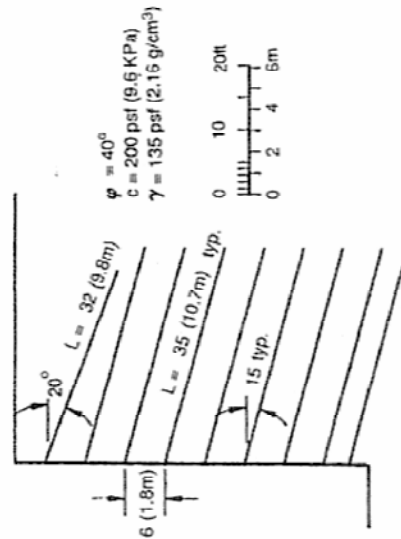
Design, construction and performance of a soil-nailed wall in Seattle, Washington—high-wall section.<sup>68</sup>
